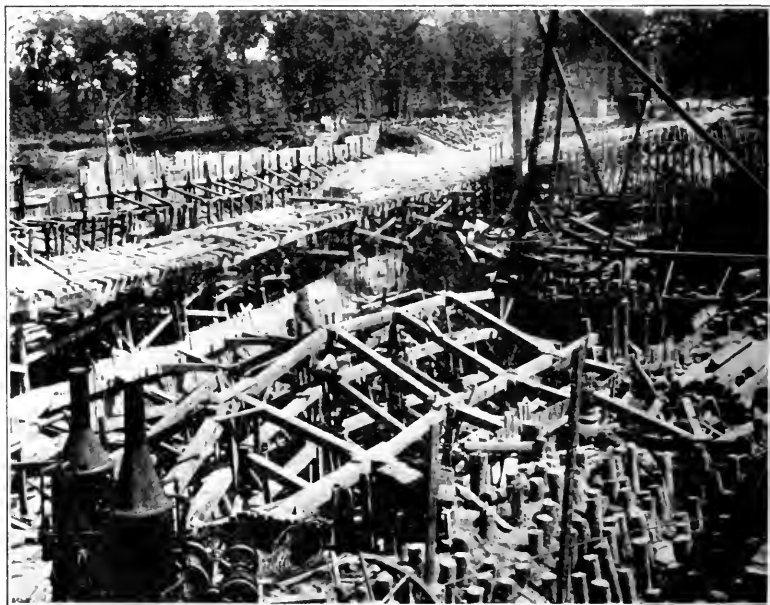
Bracing for Power House Excavation Piling Completed, Units 6 and 7.
